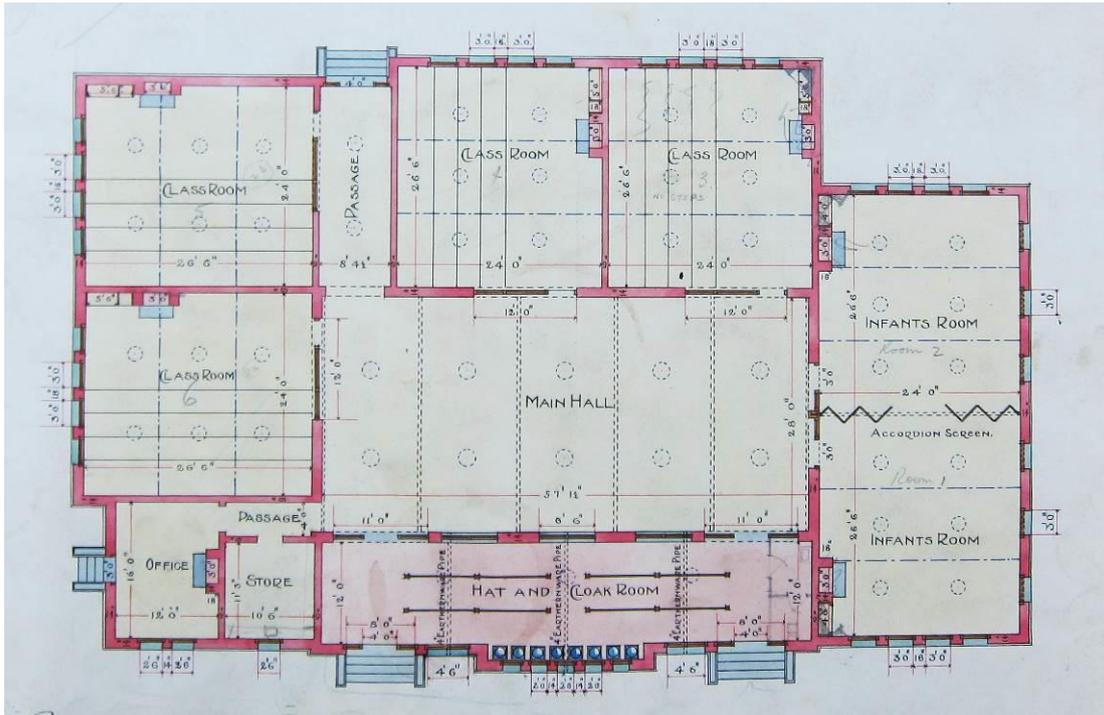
Floor plan (Source: VPRS03686P0006 UNIT000851).
